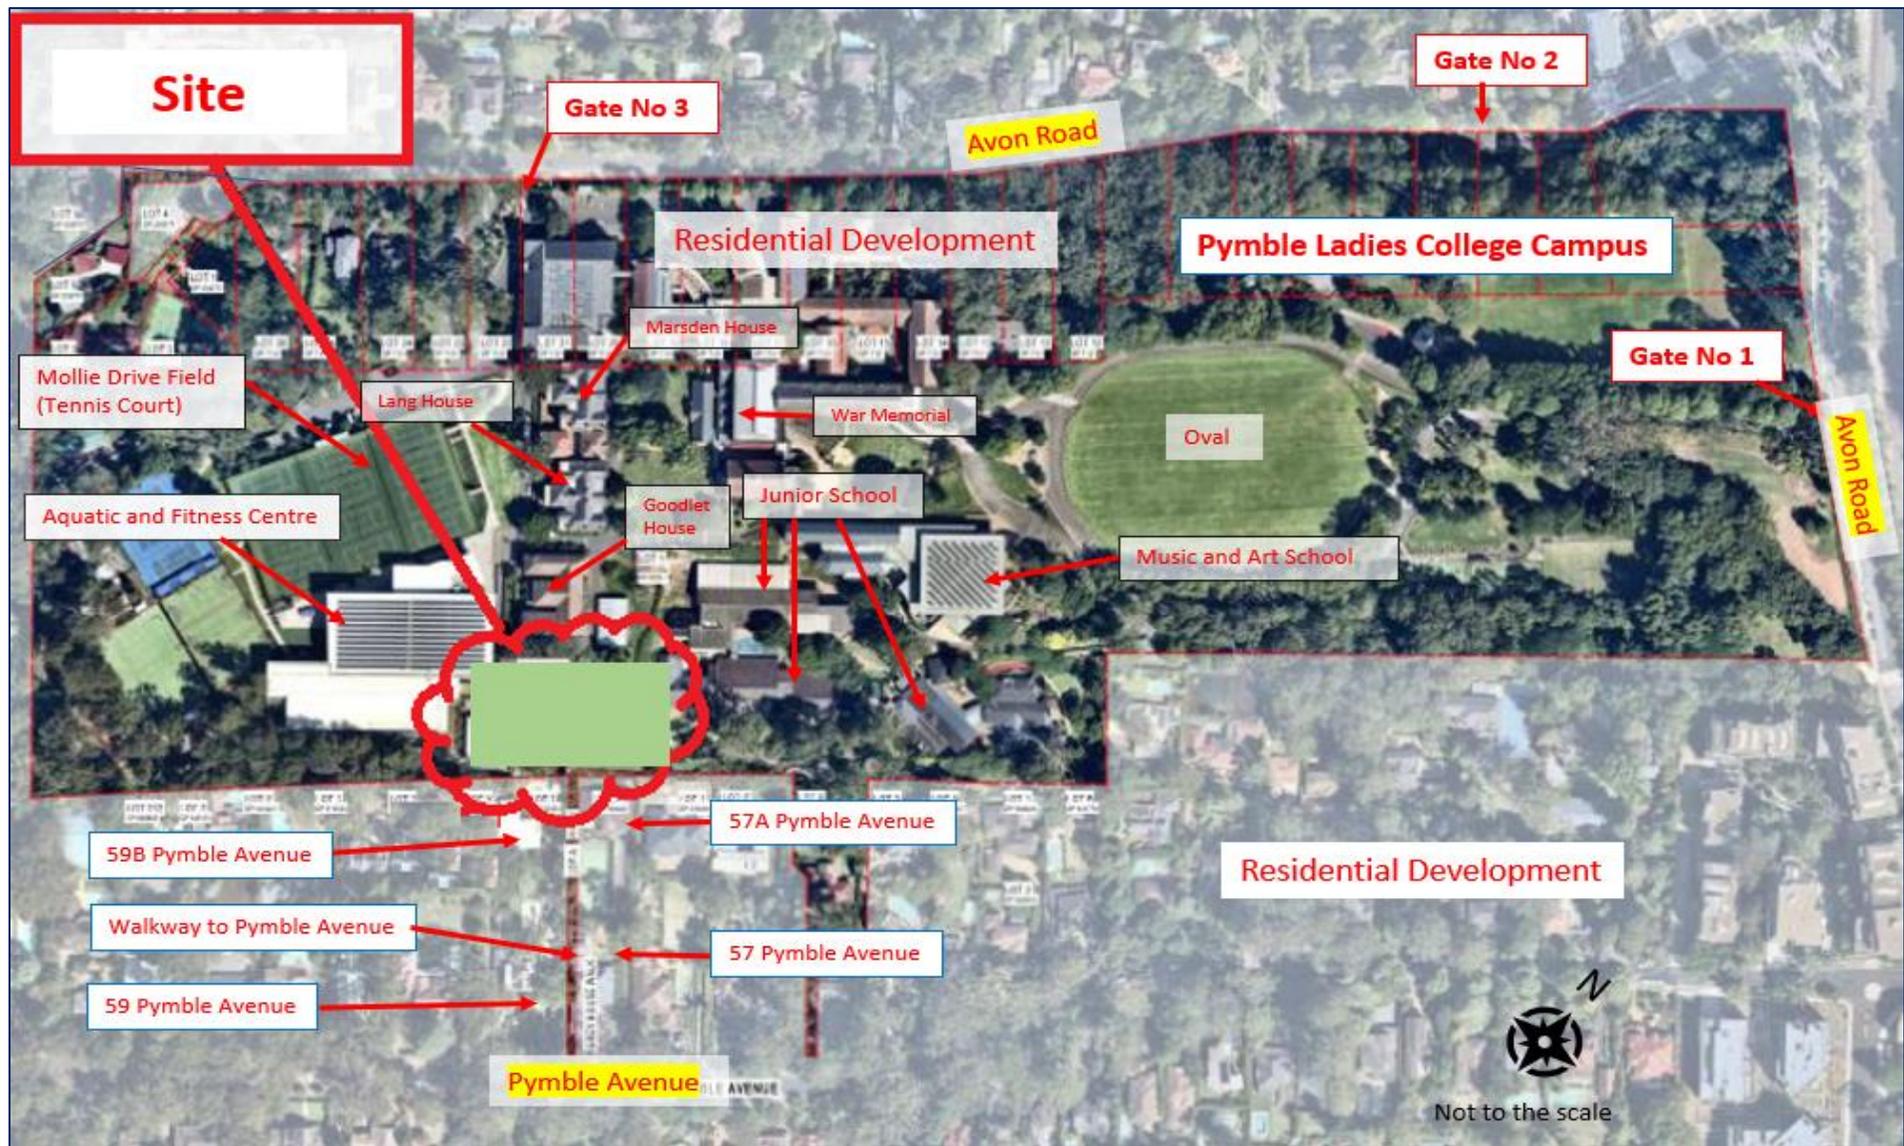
| The site and existing buildings within PLC campus (Source: Nearmap 2022)
